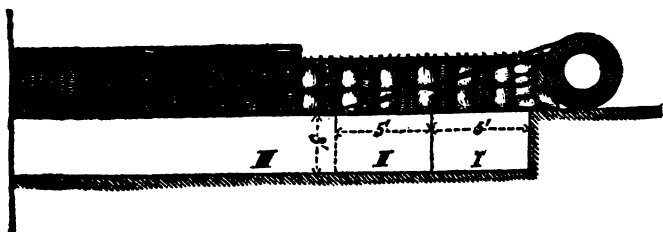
REVERSED SECTIONAL ELEVATION OF STANDING SAP.
